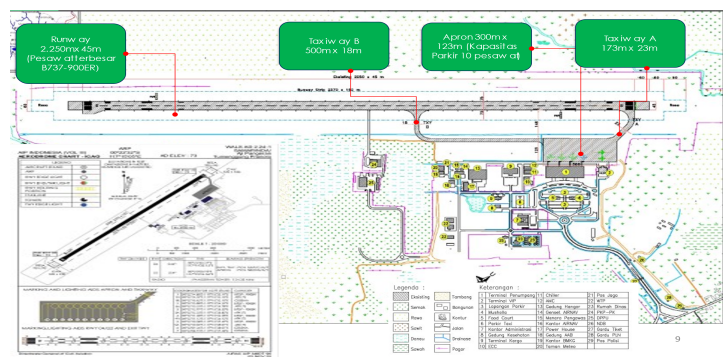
Existing Layout of A.P.T. Airport Pranoto
